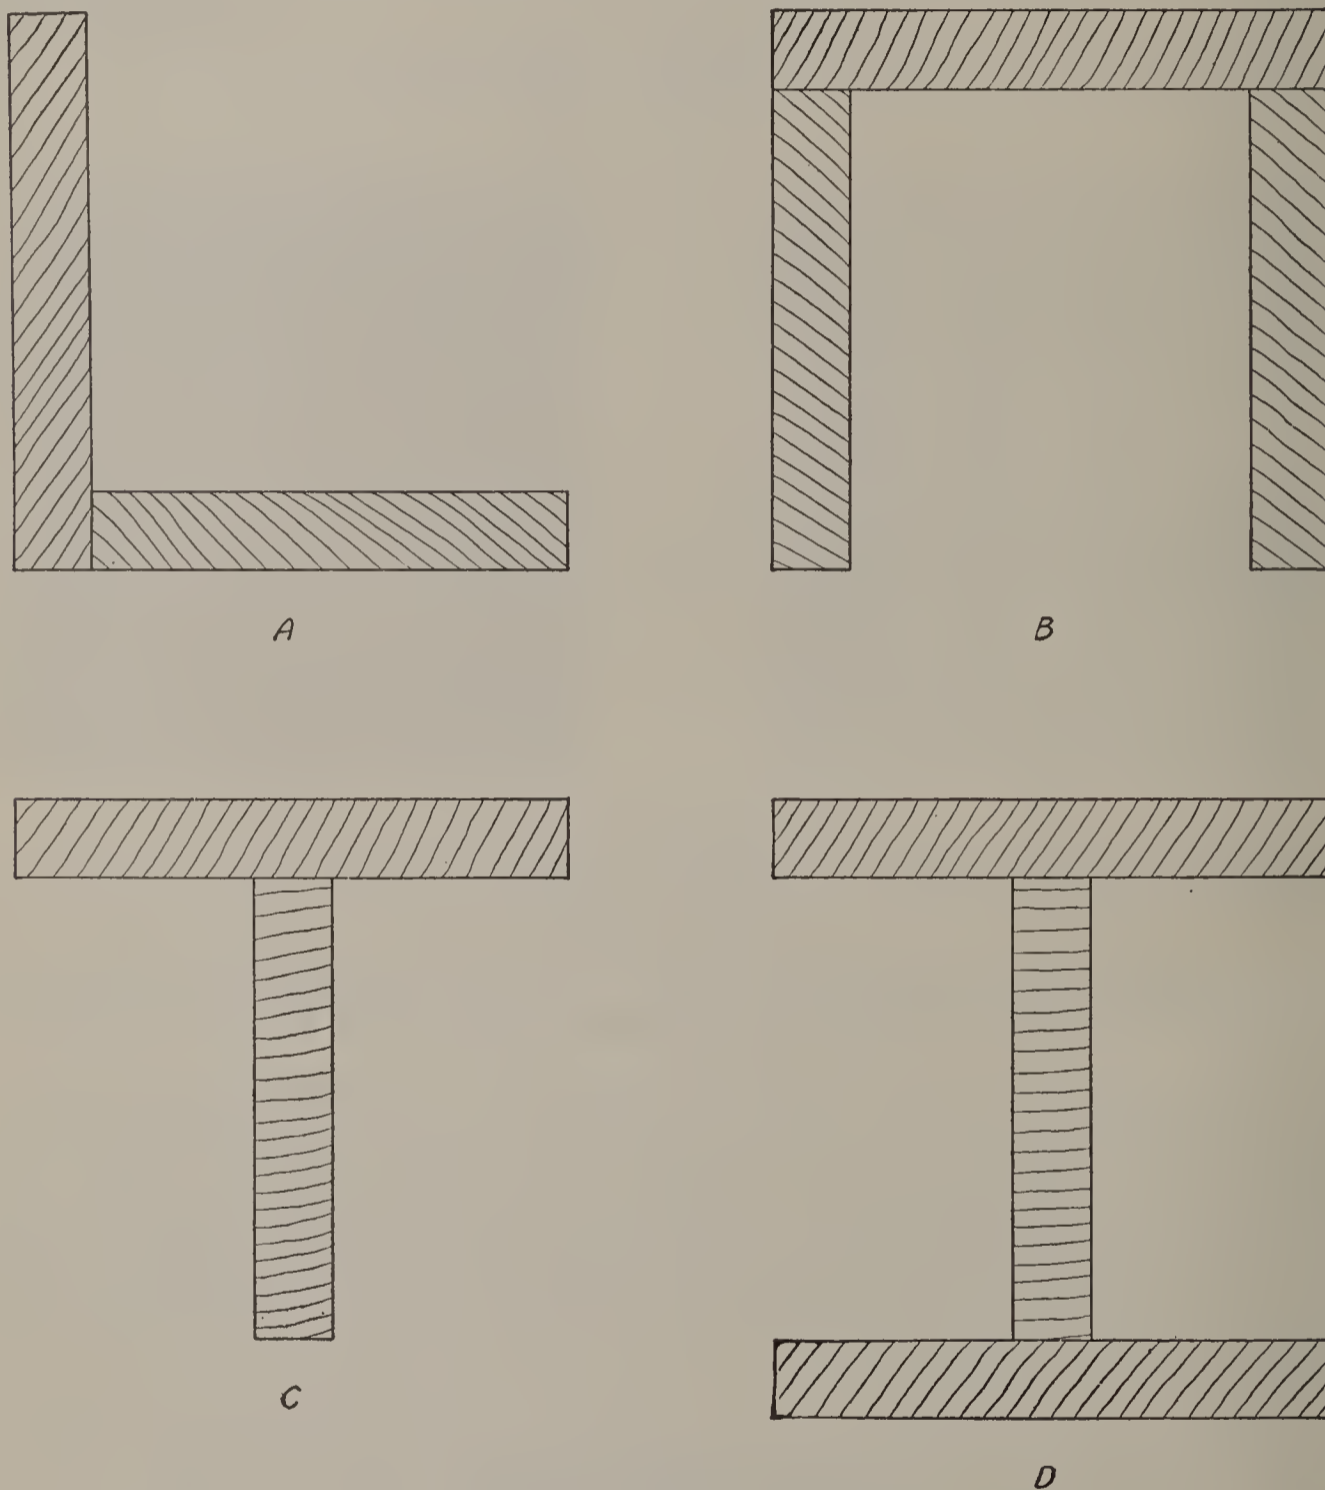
Typical cross sections of compression members that are likely to fail through elastic instability: A, L-section; B, U-section; C, T-section; D, I-section.
